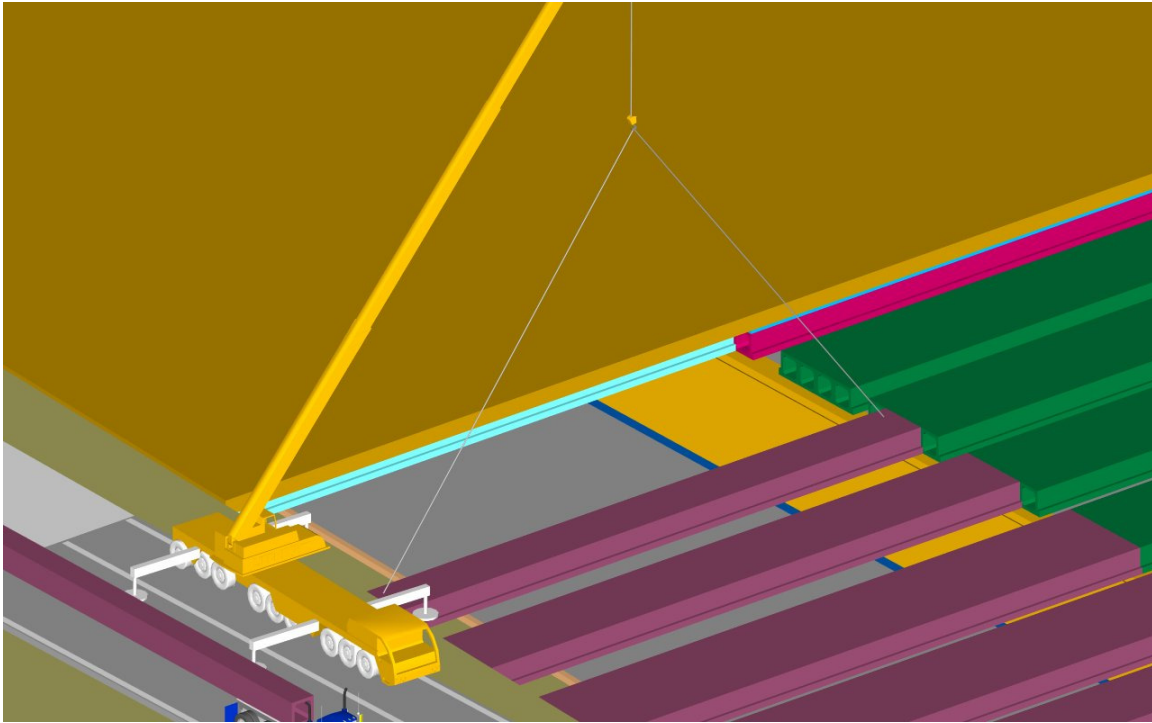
Crane Placing Beams from Frontage Road near Already Placed Beams
